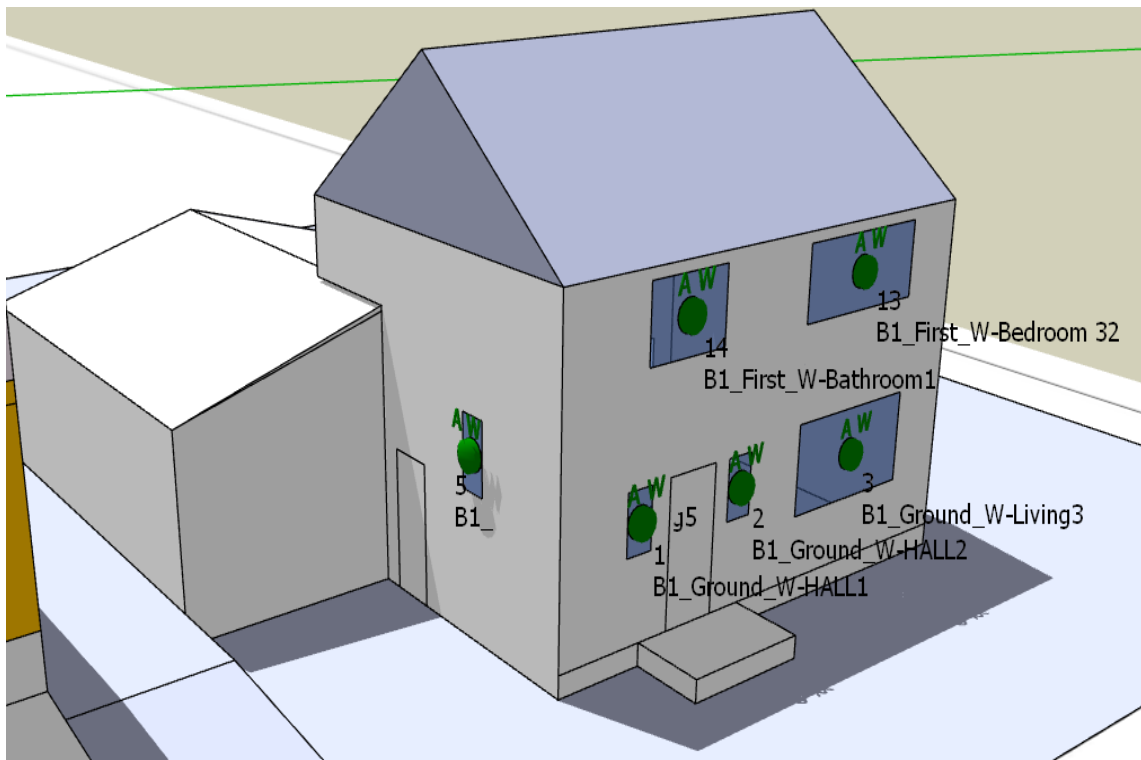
Surrounding Buildings B1-windows to be assessed – Front & side elevation of 8 St Michaels Mount
